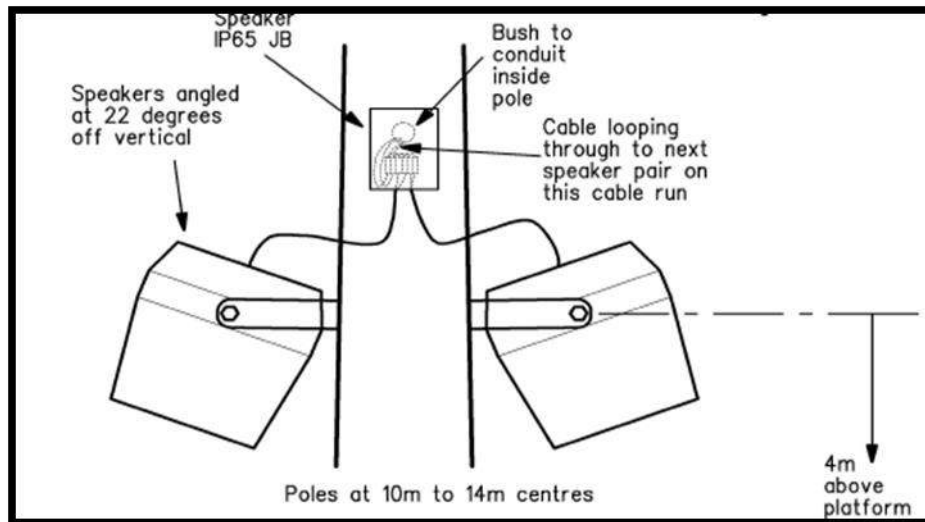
Mounting to a lighting pole (Technical Standard Part 129016)
